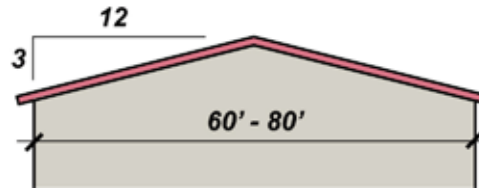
Standard roof pitch between 60'-80' wide.
